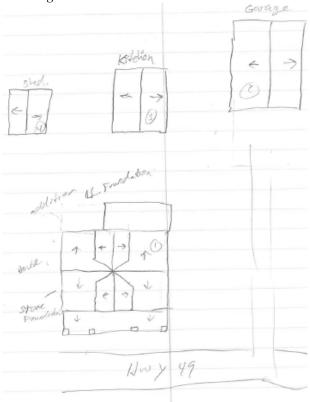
MN 656, Site plan. Building # 4, marked "shed," appears to be a meat house (field notes: Danielle Jamieson & Anna Ruhl, 4/7/2007). See also Figure 212.
